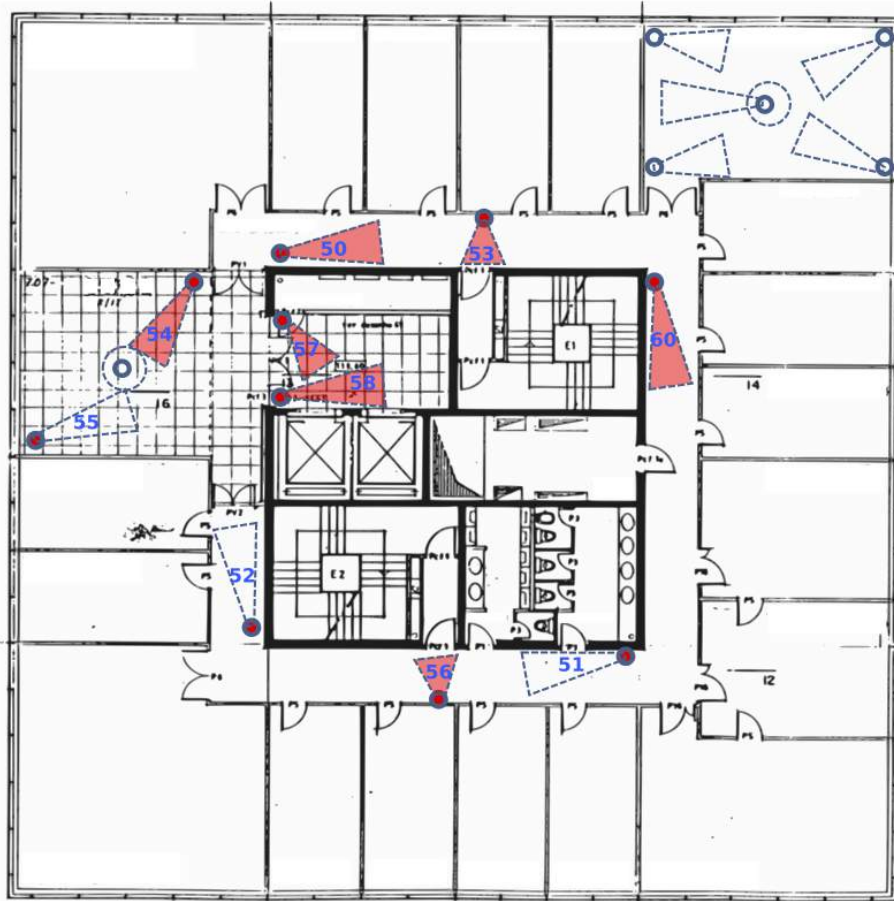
Floor plan of Floor 7 at ISR-Lisbon [39]
